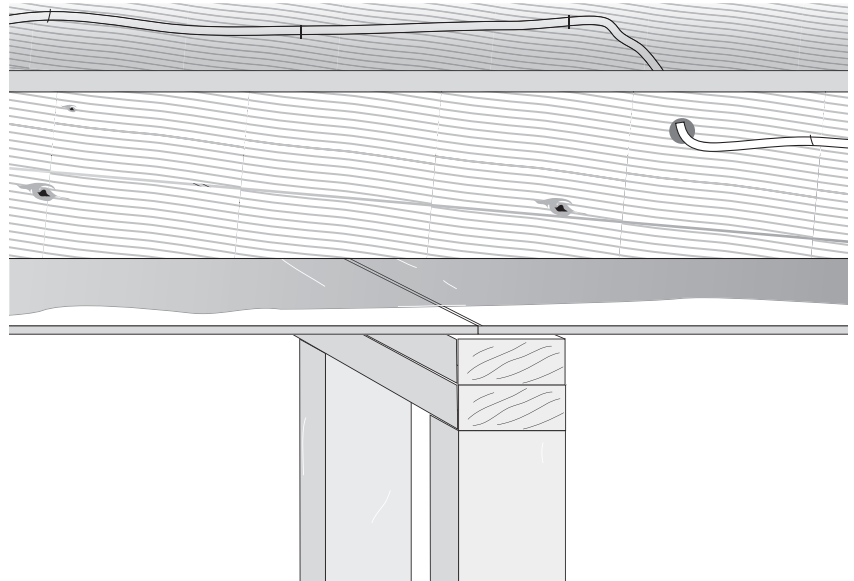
Applying polyethelene vapor barrier and drywall on the ceiling before putting up interior walls.
